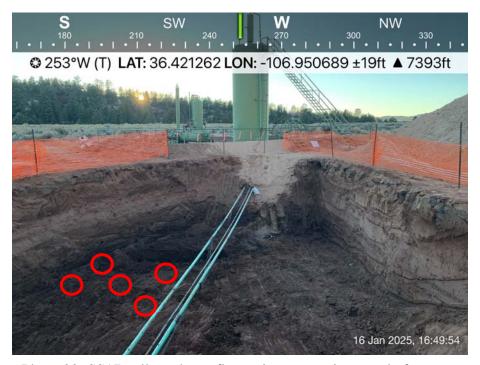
SS17 collected as a five-point composite sample from southern base of excavation.
